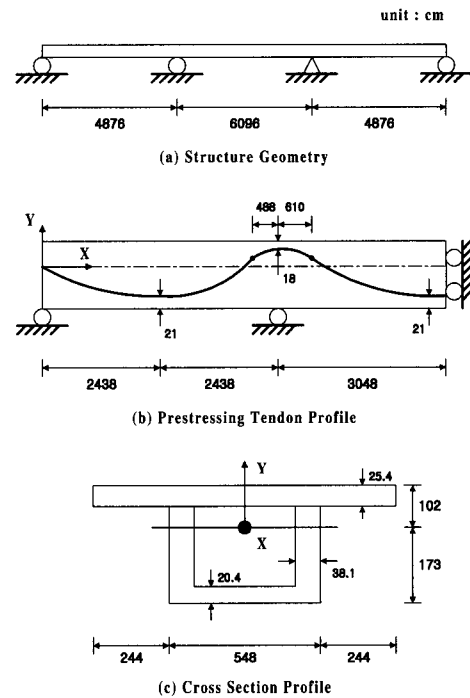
Three span post-tensioned box girder bridge (Choudhury bridge)<sup>(12)</sup>
